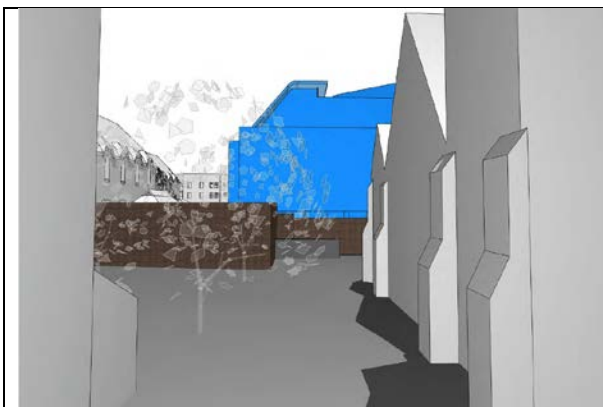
| View of eastern elevation of proposed building envelope, from Notre Dame Courtyard
